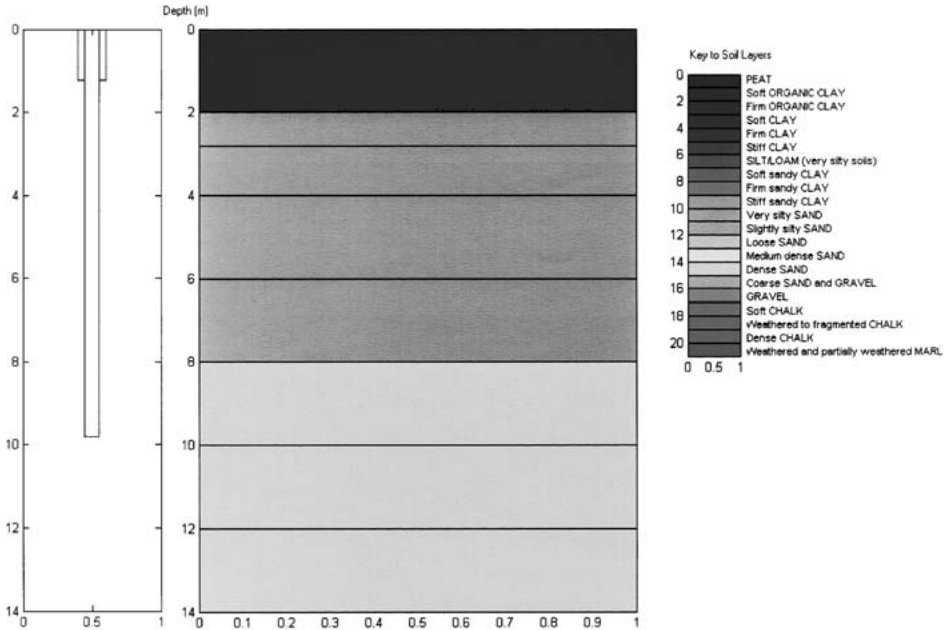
Pile elevation and soil profile generated by GLAMCPT.
